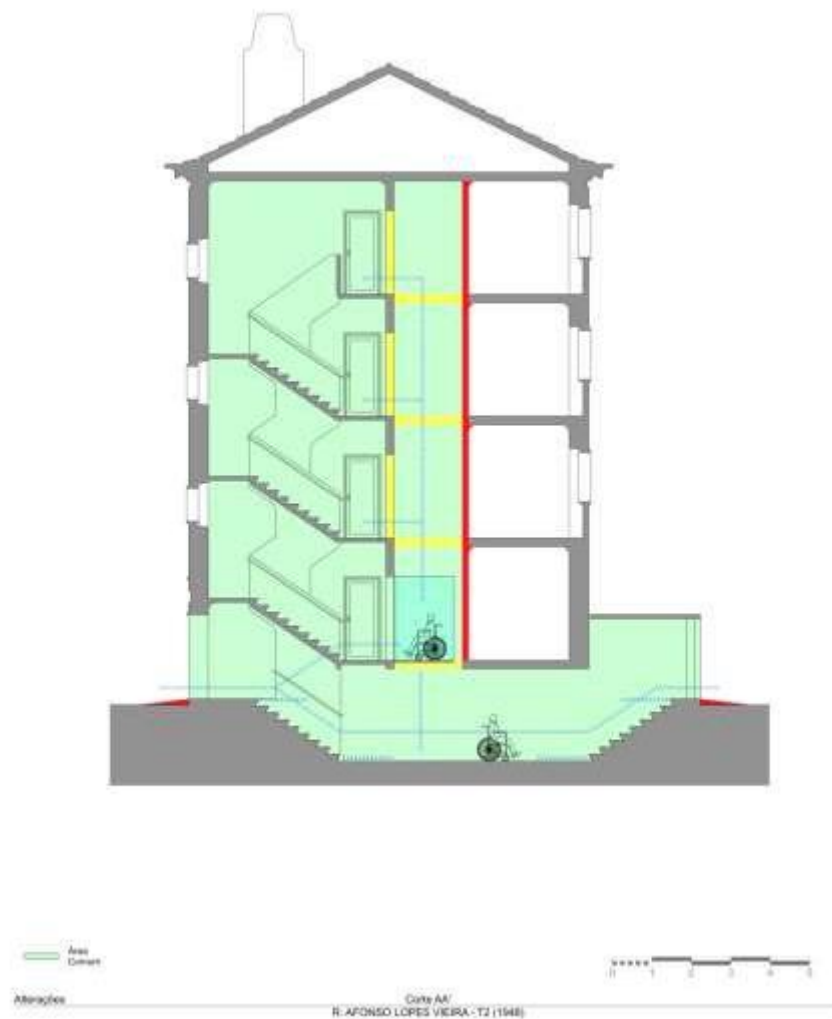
Street Afonso Lopes Vieira, T2 Building – proposal — section through tunnel and staircase
